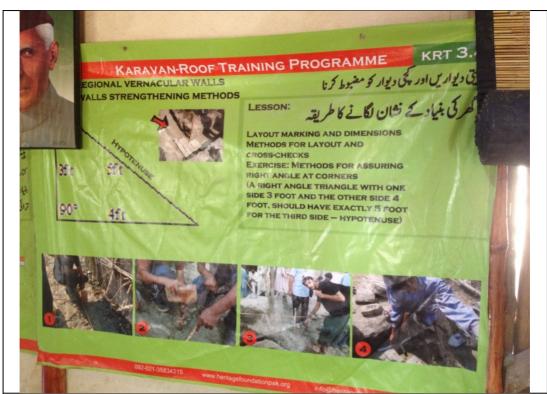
Heritage Foundation, Tando Allah Yar Training Poster
